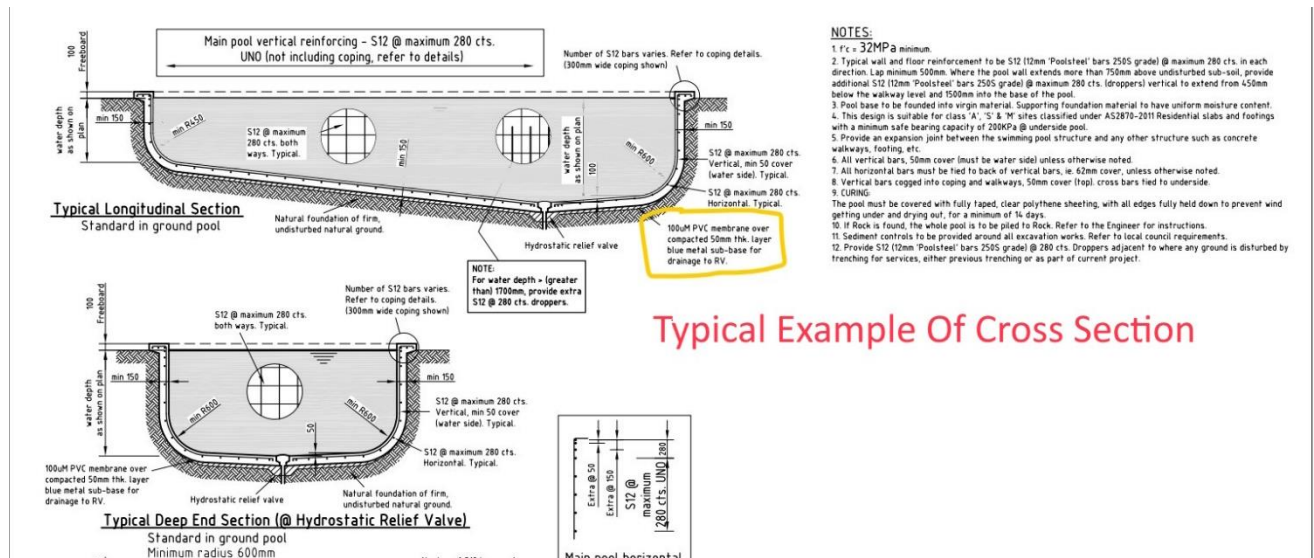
Typical well designed concrete pool, showing DPC outside of concrete shell.
